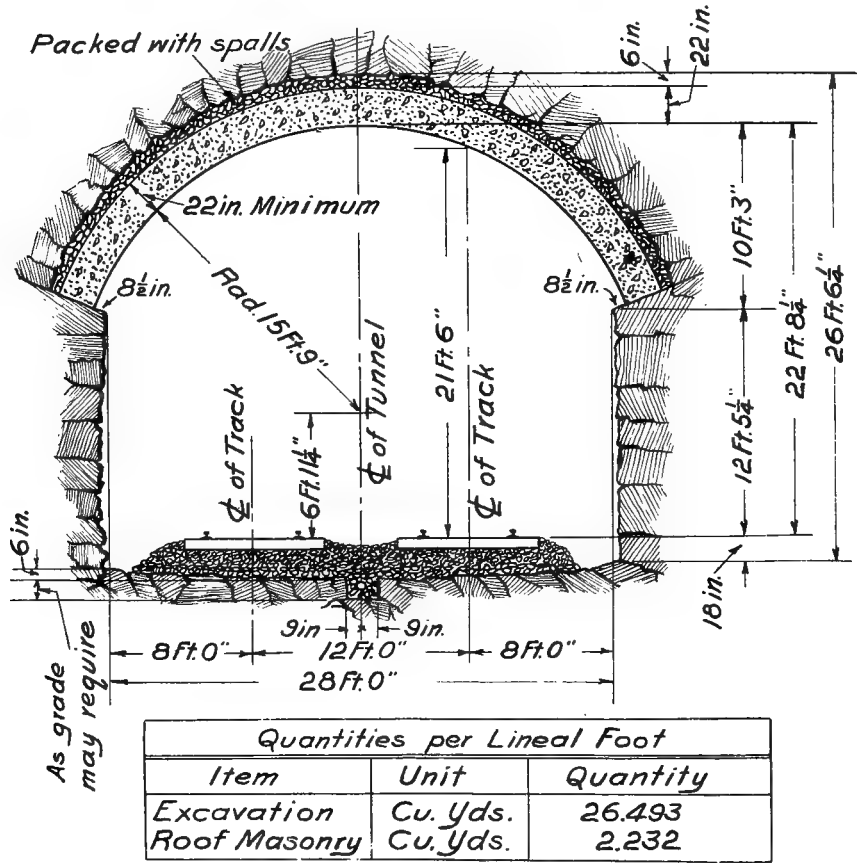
STANDARD TUNNEL, N. Y. C. & H. R. R. R., TYPE B, SOLID ROCK, FIRM SIDES AND ROOF, DANGER FUTURE FALLS.
